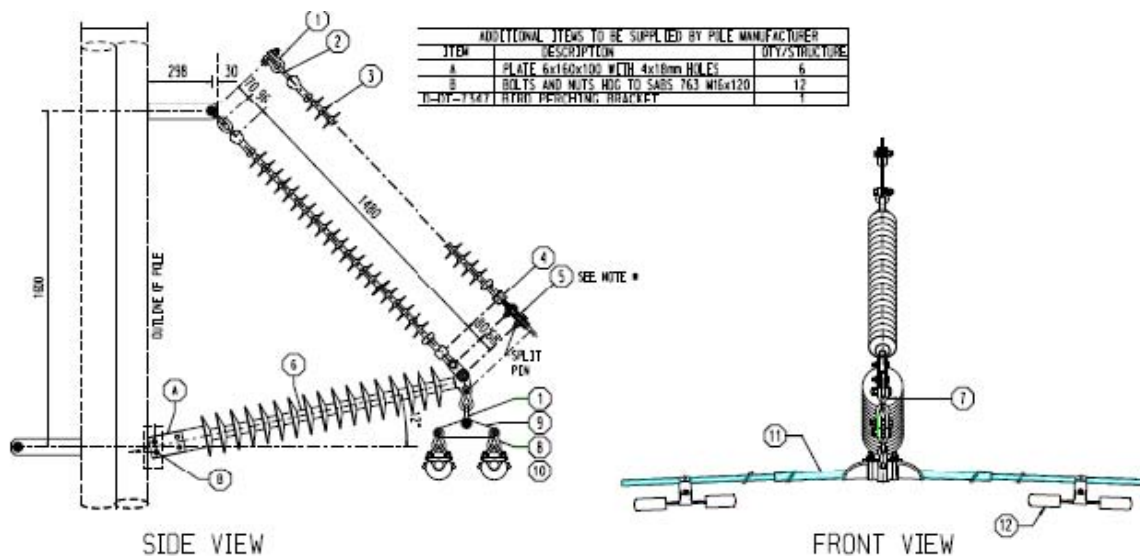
Phase Conductor Braced Horizontal Suspension Assembly for Twin “Conductor”
